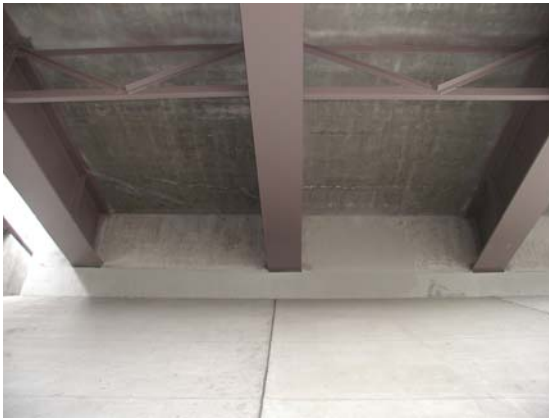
Typical Photos of Bridge #76, I-15 South Bound over 3300 South.
